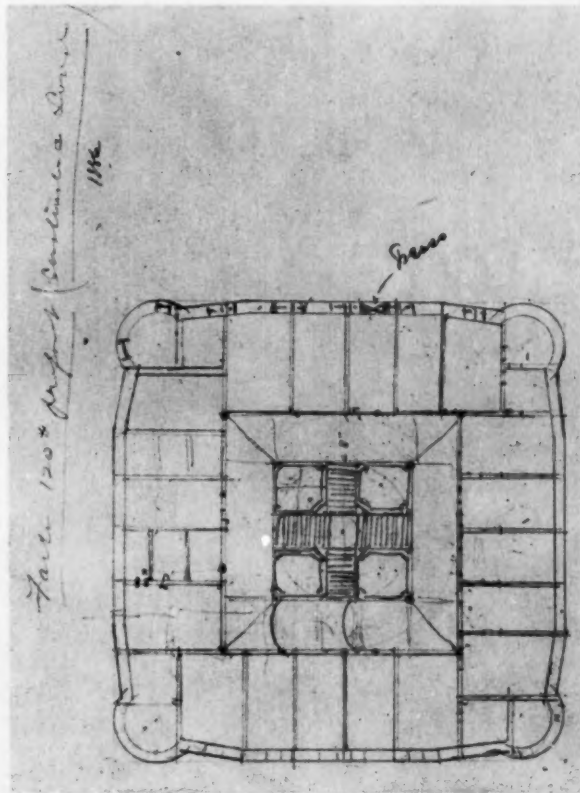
Typical Floor Plan for 28-Story Building, Dated 1886
